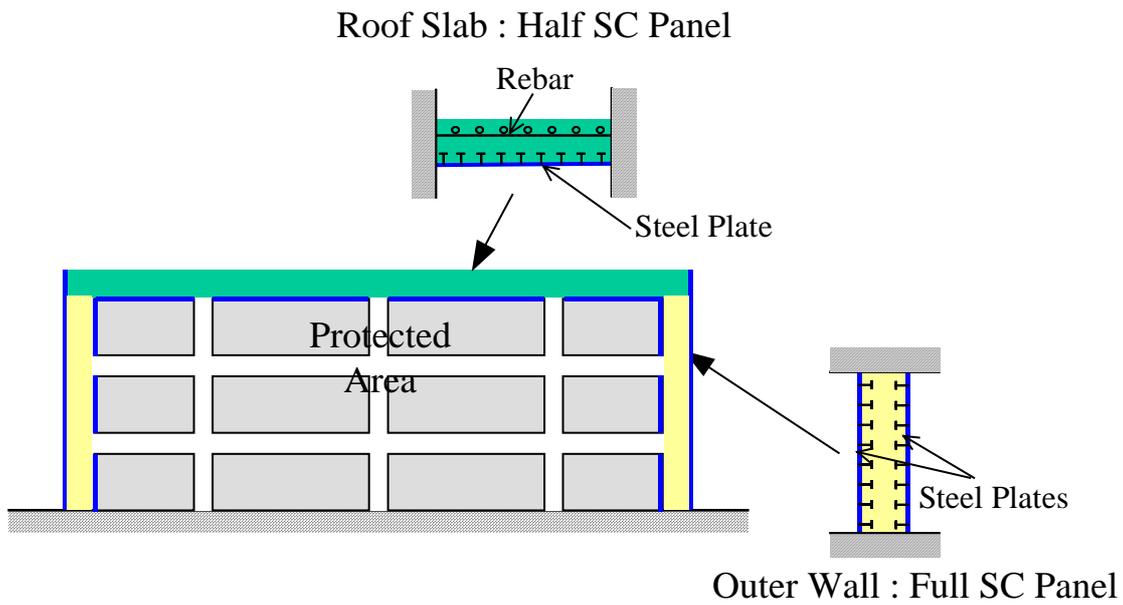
Schematic Illustration of Full SC Wall and Half SC Slab
